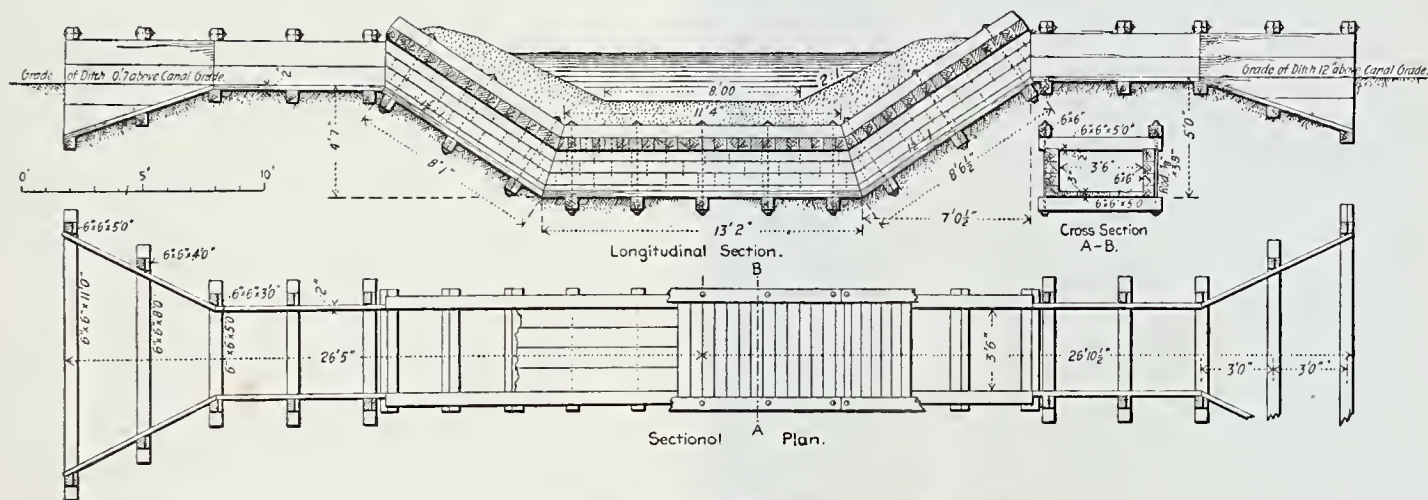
Inverted Siphon for passing old canal, Bear River, Utah.
